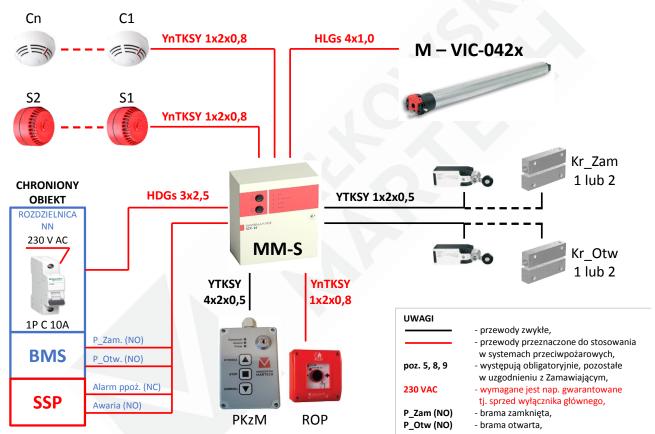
MARC-Ok fire curtain door accessories kit with the VIC-042x drive motor
